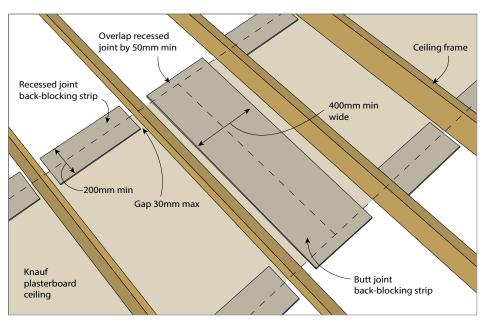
Placement of Back-Blocking Strips For Recessed and Butt Joints
